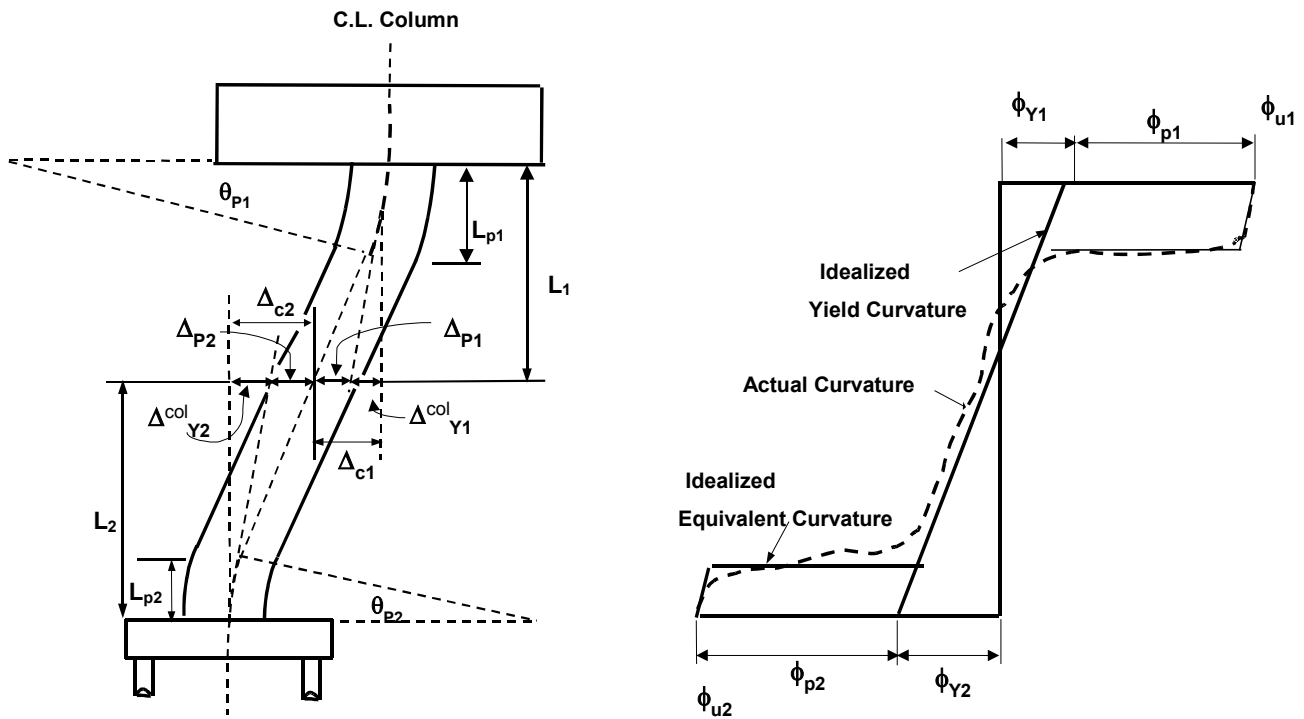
Local Displacement Capacity – Framed Column, Assumed as Fixed-Fixed
